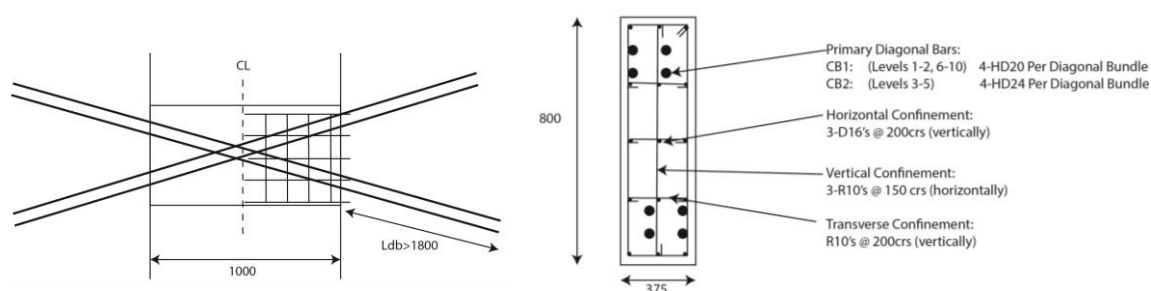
Coupled Wall 2 (CW2) coupling beam design (wall piers match base model)
